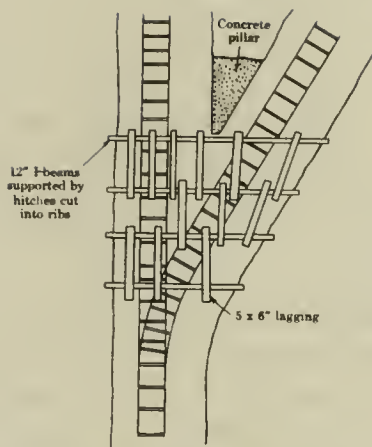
PLAN OF METHOD OF ROOF SUPPORT AT INTERSECTION OF ENTRIES
